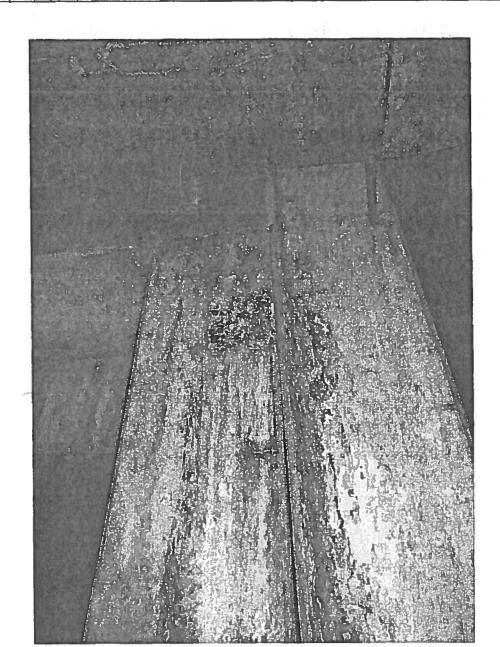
Item #2-Water infiltration due to failed expansion joint at columns/spalled concrete
